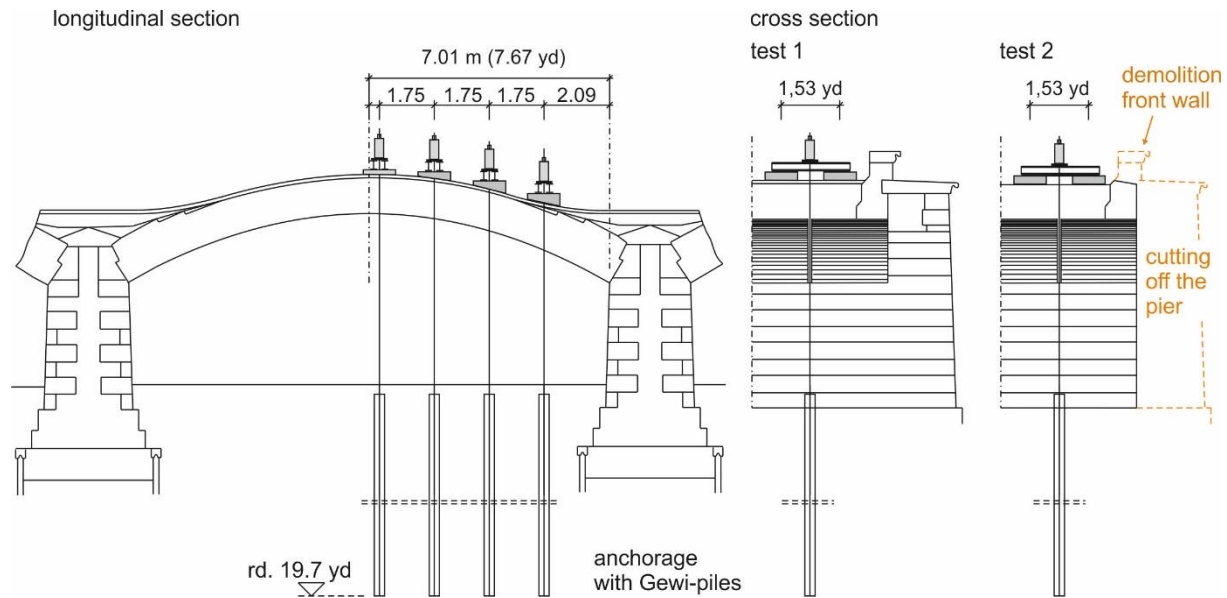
Load and testing arrangement for the masonry arch bridge over the Aller
